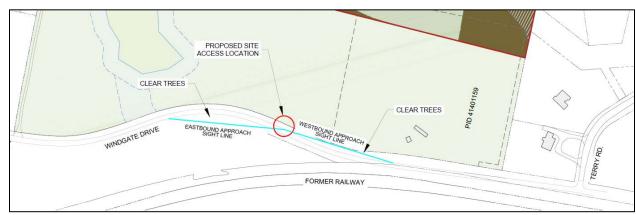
Sightlines at Proposed Site Access Location approximately 390m West of Terry Road
